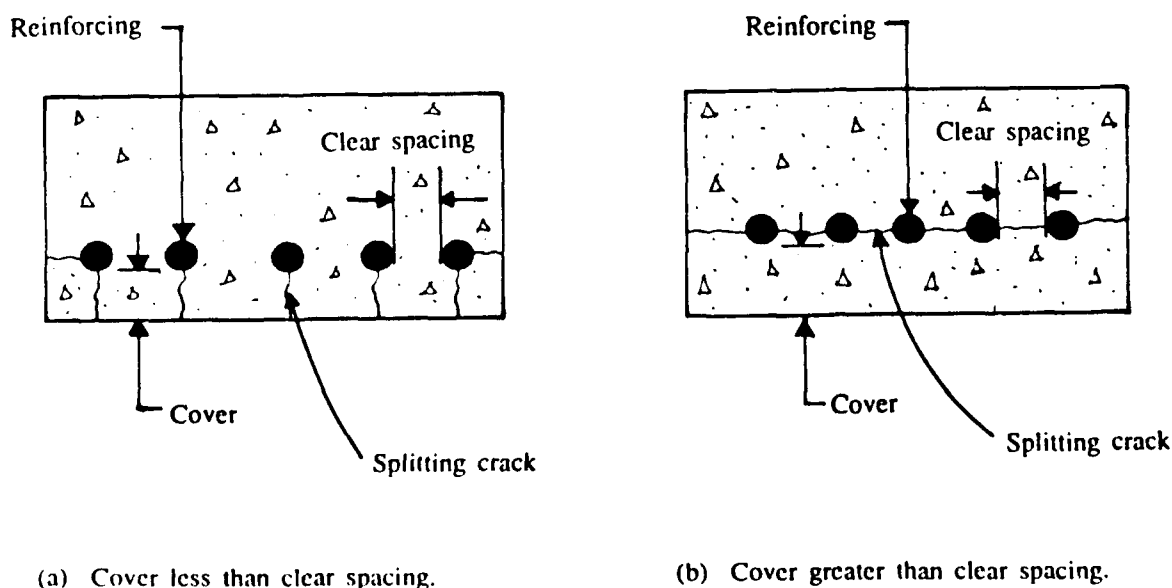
Splitting cracks in reinforced concrete beams.
